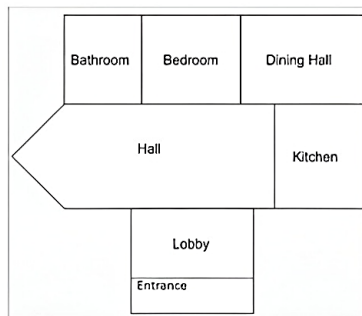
Create Design Schemes and Alternatives of Floor Plans Using The Stanislaschailou Platform
